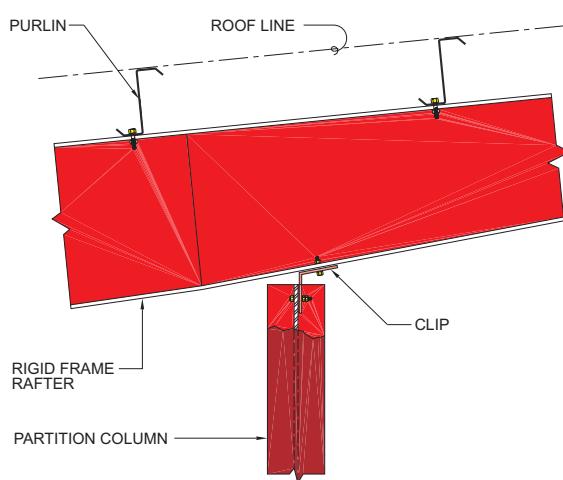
DETAIL-B : PARTITION COLUMN CONNECTION AT PURFLIN
